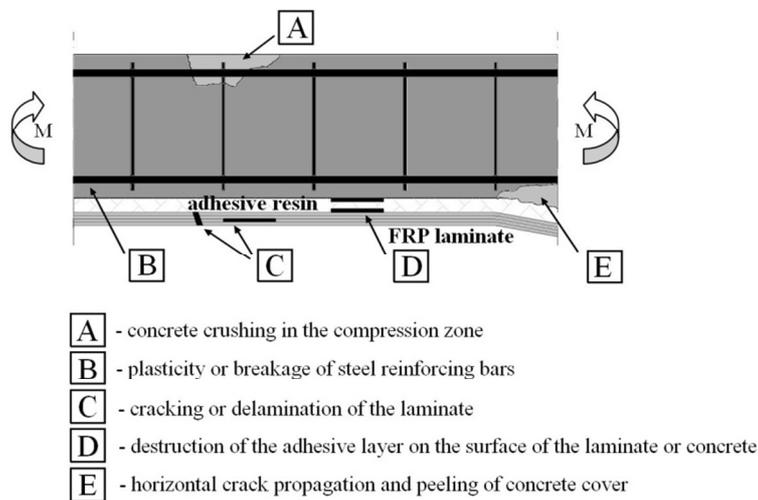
Failure modes of a reinforced concrete beam strengthened with a composite laminate
